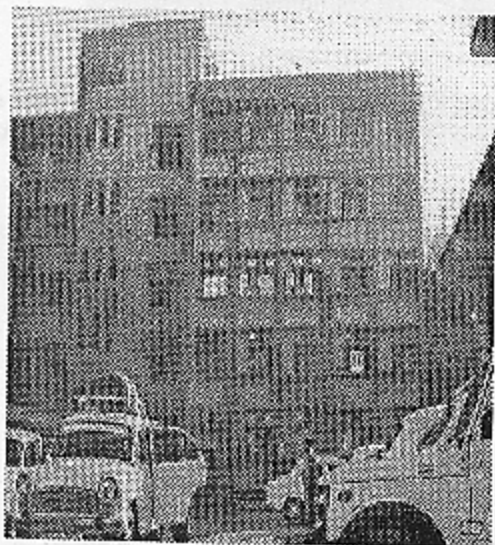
Undamaged lift core of a reinforced concrete building
